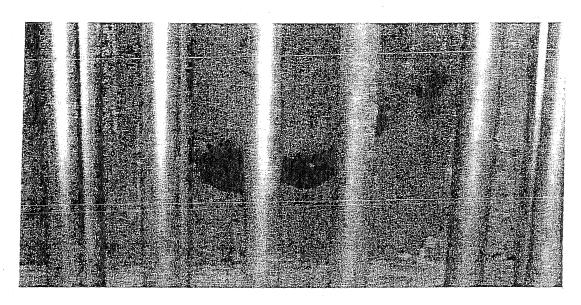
3TS4, Suspect Stain on Concrete, North Wall.
